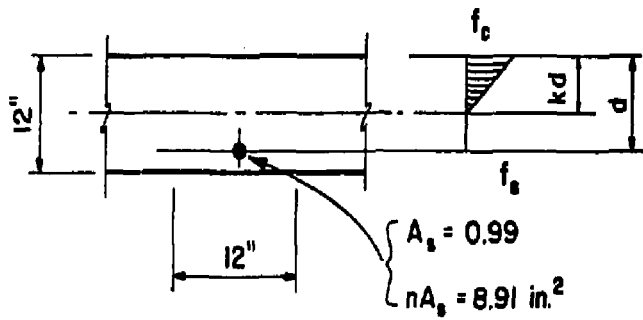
REINFORCED CONCRETE WALL CROSS SECTION
